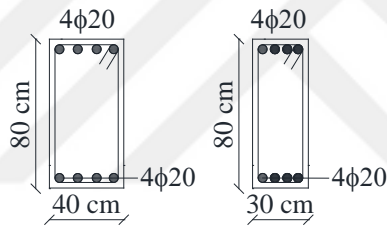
Cross sections and reinforcement details of the columns (left: Up to 5th normal floor, right: 5th to 17th normal floors).
